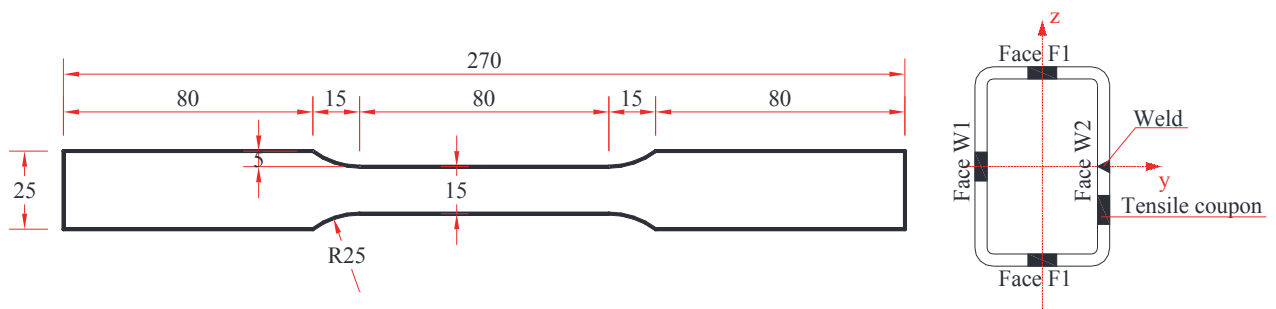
Tensile coupon dimensions and locations of the tensile coupons
